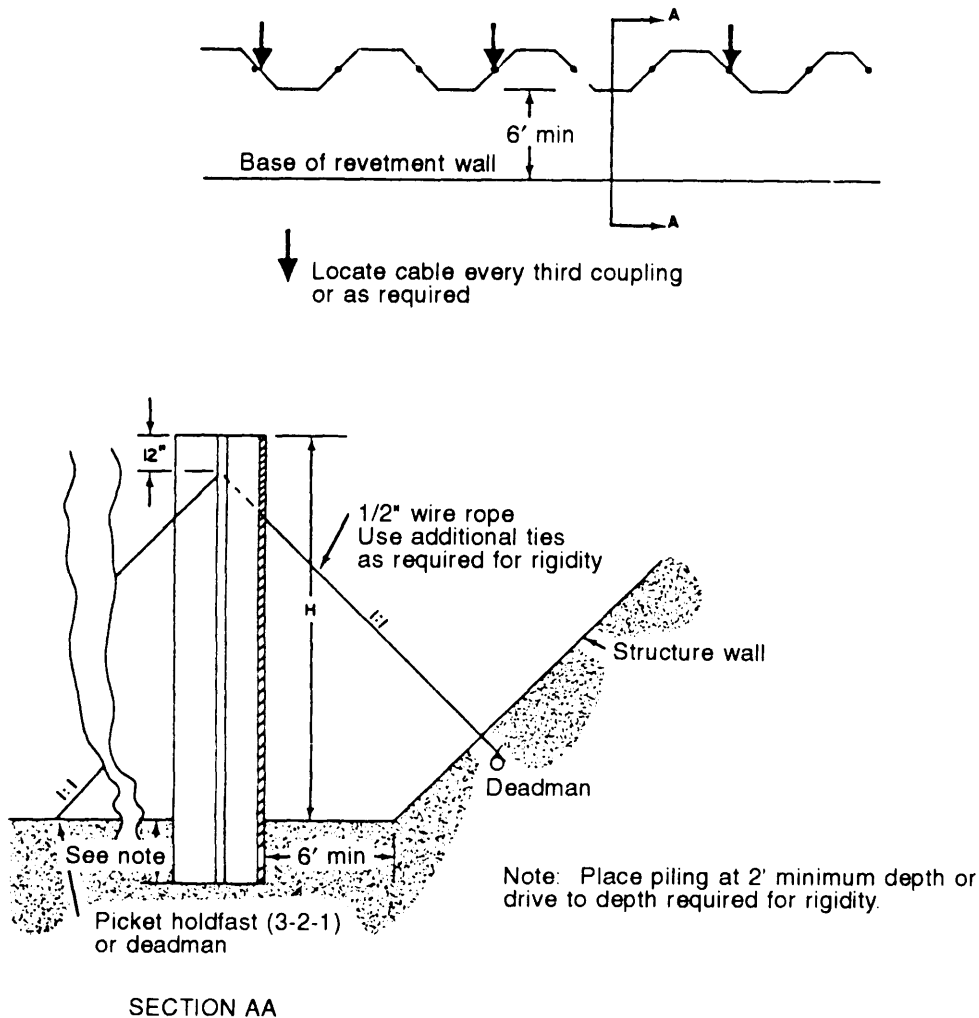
Standoff construction using steel sheet pile - Condition II
